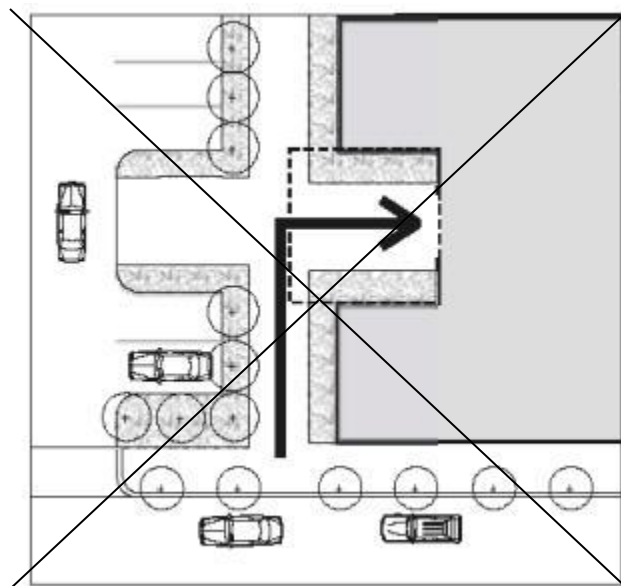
(B): Example of connection of building entrance which is not located on a street but has a clear pedestrian walkway to it.
